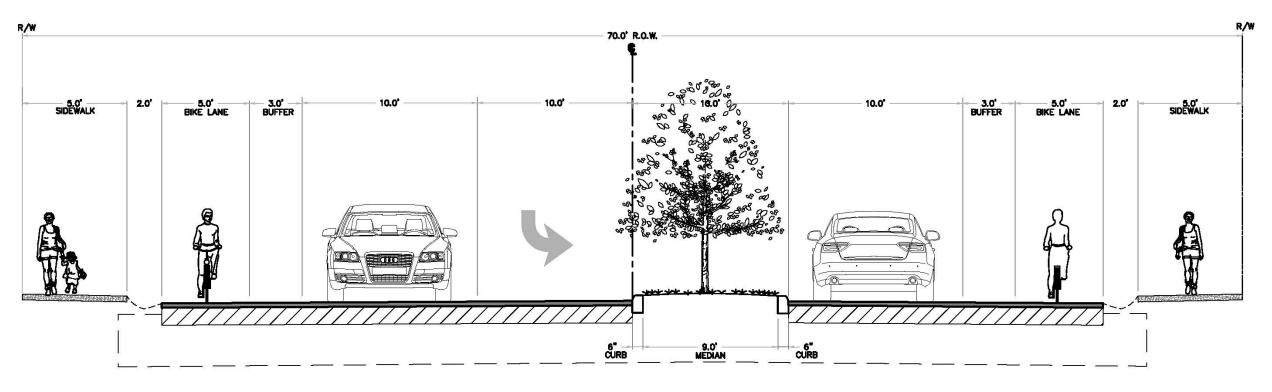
Existing and Proposed Conceptual Typical Section, NE 15th Avenue "Road Diet" Project
